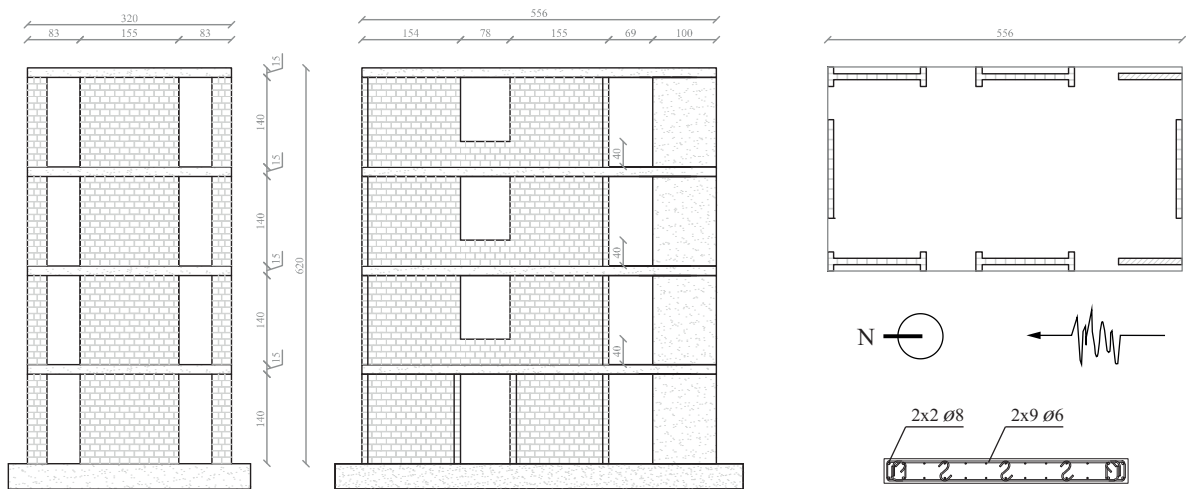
Mixed RC-URM building: Plan, side views and RC wall section of the RC/URM building prototype
